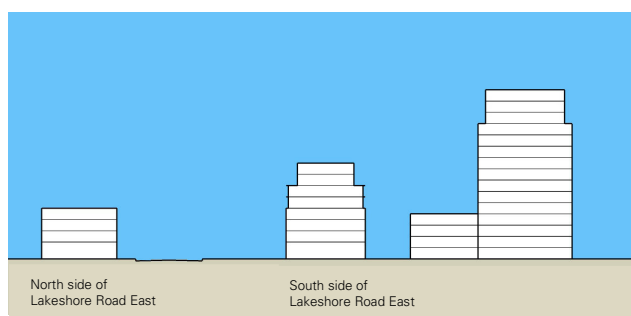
Development in the Lakeview Waterfront along Lakeshore Road East with an 8 storey building and a 15 storey building behind.
